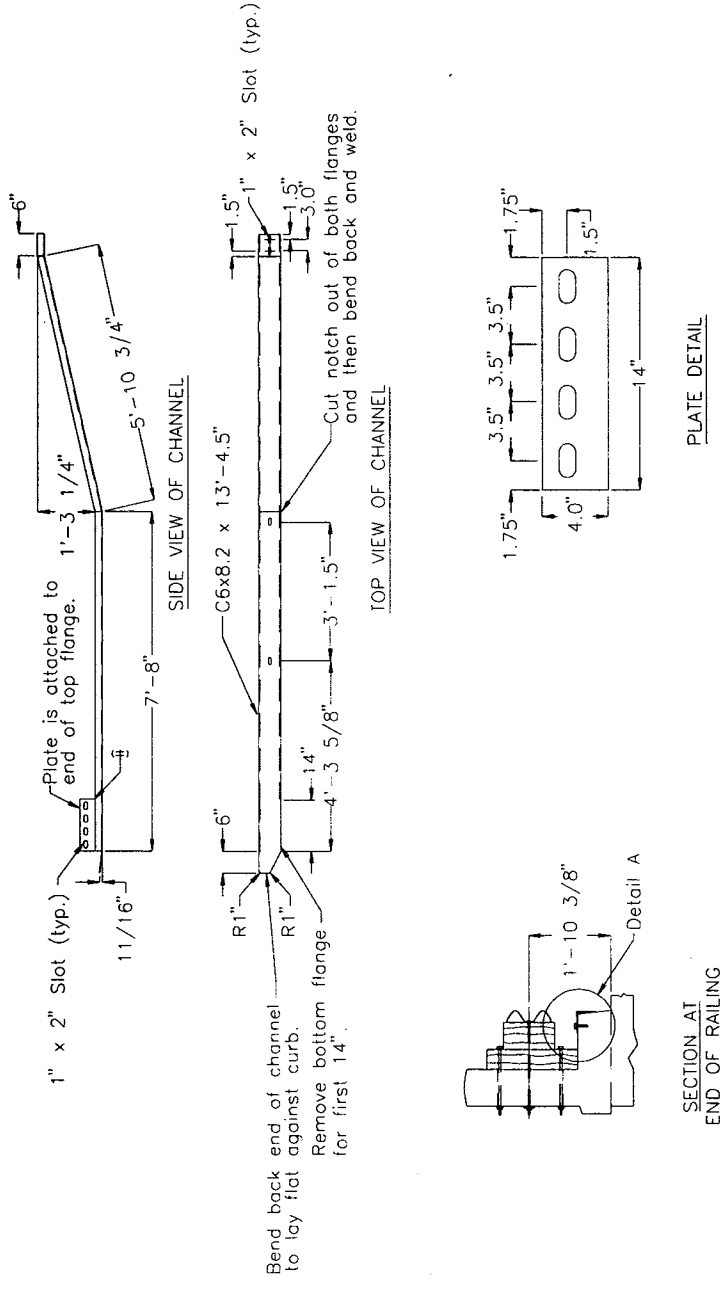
W-beam retrofit transition for W-beam retrofit concrete baluster bridge railing.
